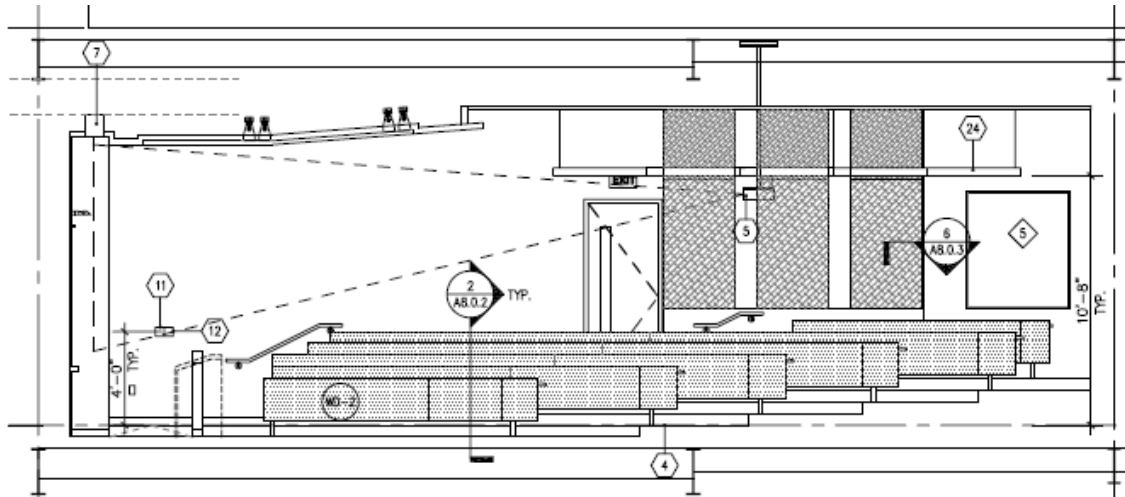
135-Seat Classroom North Elevation/Section
